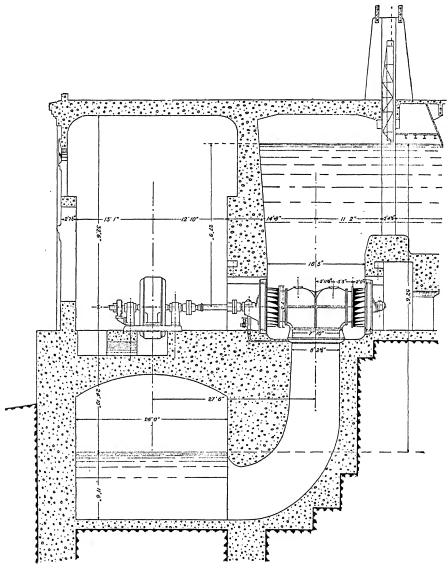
Twin-runner Open-type Turbine, with Back Bearing in Inspection Tunnel
